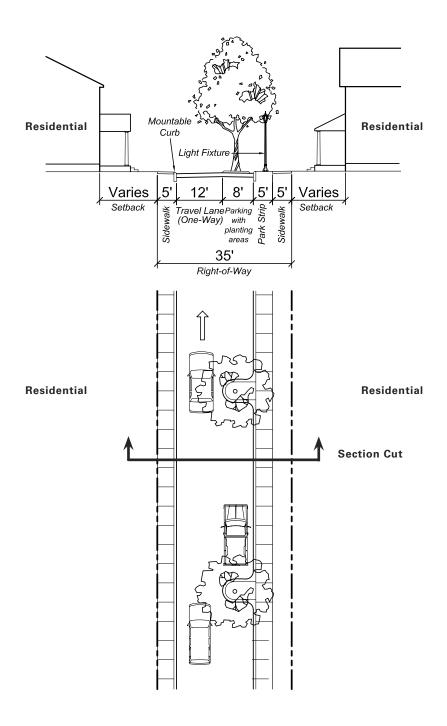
Proposed Section and Plan: Neighborhood Street C
